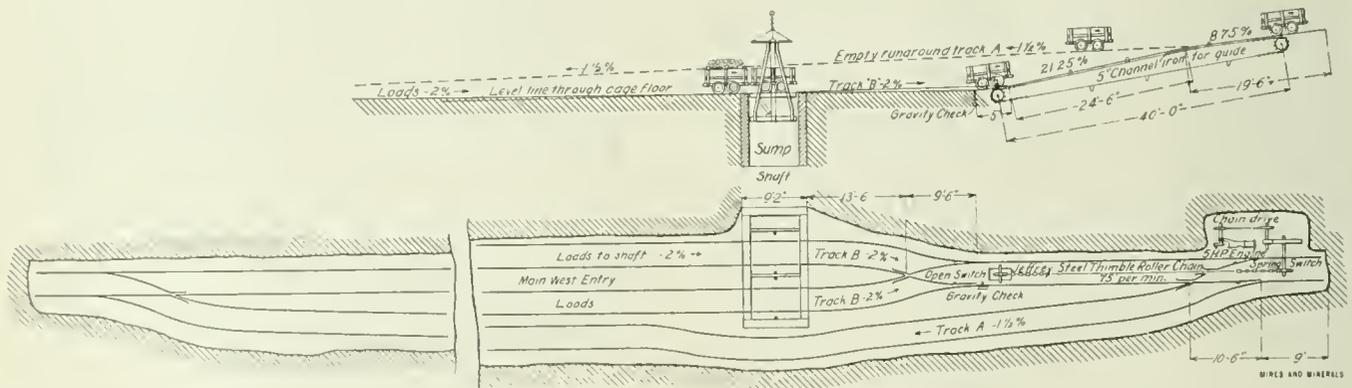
PLAN OF SECTION OF SHAFT BOTTOM AND CAGING ARRANGEMENTS
